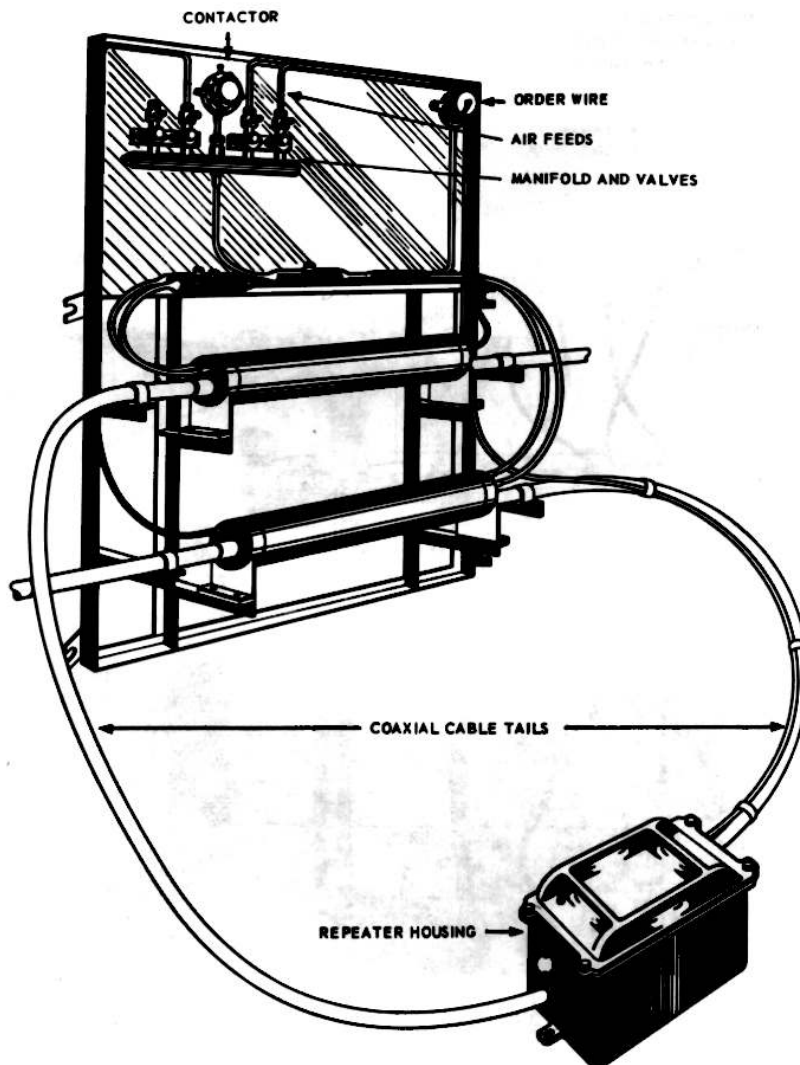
TYPICAL LAYOUT IN MANHOLE WITH COAXIAL REPEATER.
